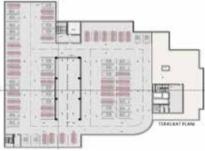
1st, 2nd, 3rd Normal Floor Plans
